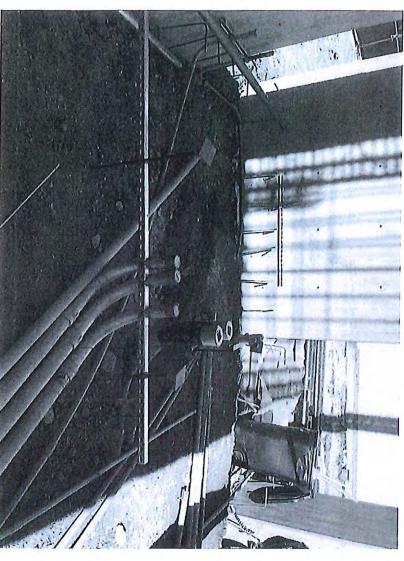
PHOTO OF EXISTING CONDITIONS- ROOM 2166 VIEW FROM SOUTH LOOKING NORTH
